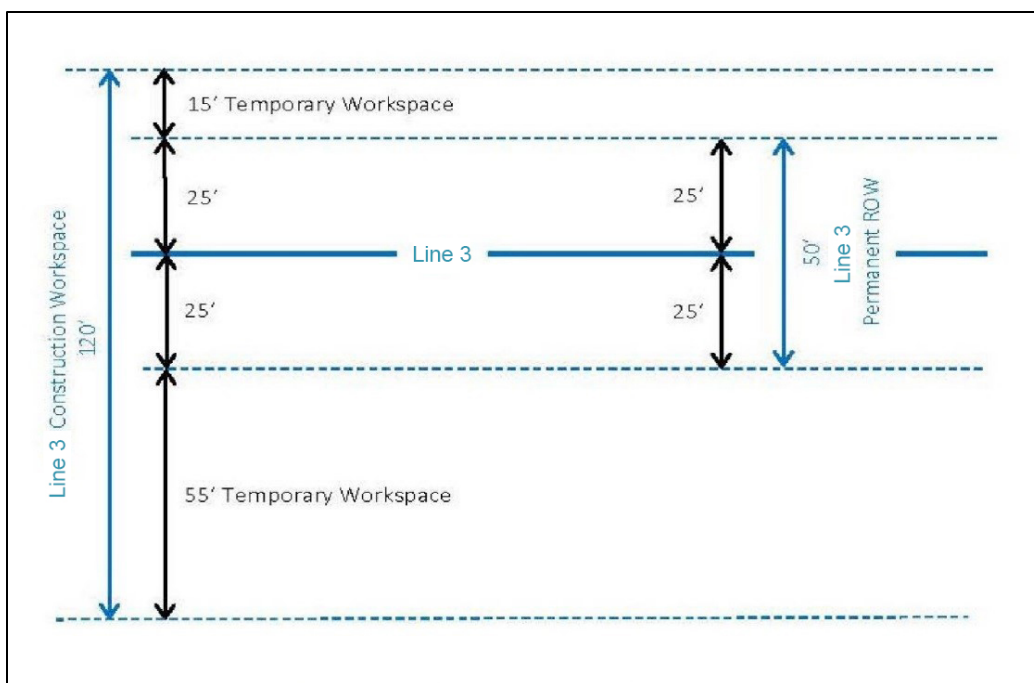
Plan View – Permanent Right-of-Way and Construction Work Area for the Proposed Line 3 Pipeline Route not Co-Located with Other Facilities in Uplands
